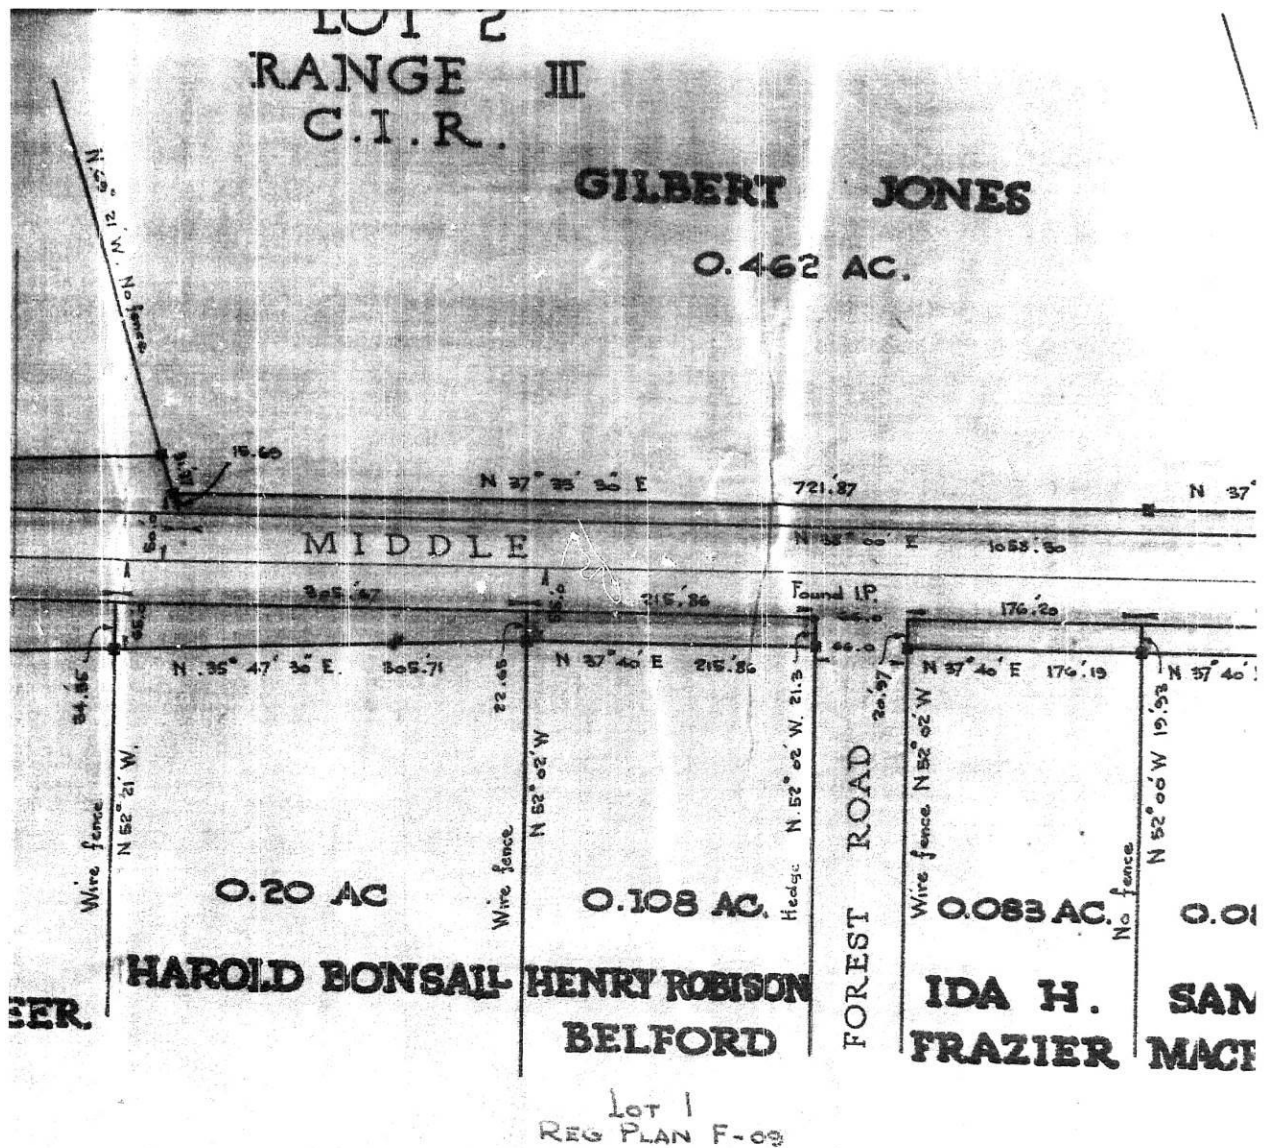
Detail from John E. Jackson, "Plan of the King's Highway, Middle Road, in the Township of Toronto, County of Peel, Assumed by Deposited Plan No. 546 and Land Plan Shewing Diversion and Widening: Drawing No. P-1857-8," Deposit No. 557, 26 Apr. 1934, Peel Land Registry Office.
